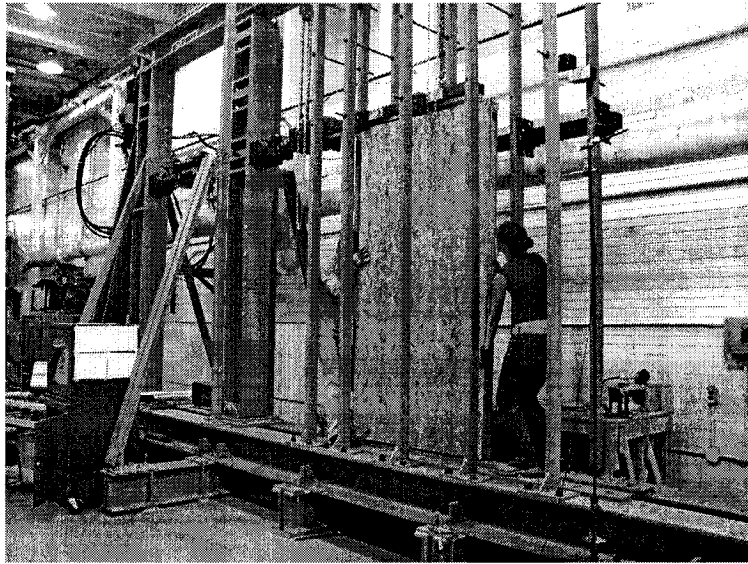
Wall specimen being loaded into the test frame from the right side
